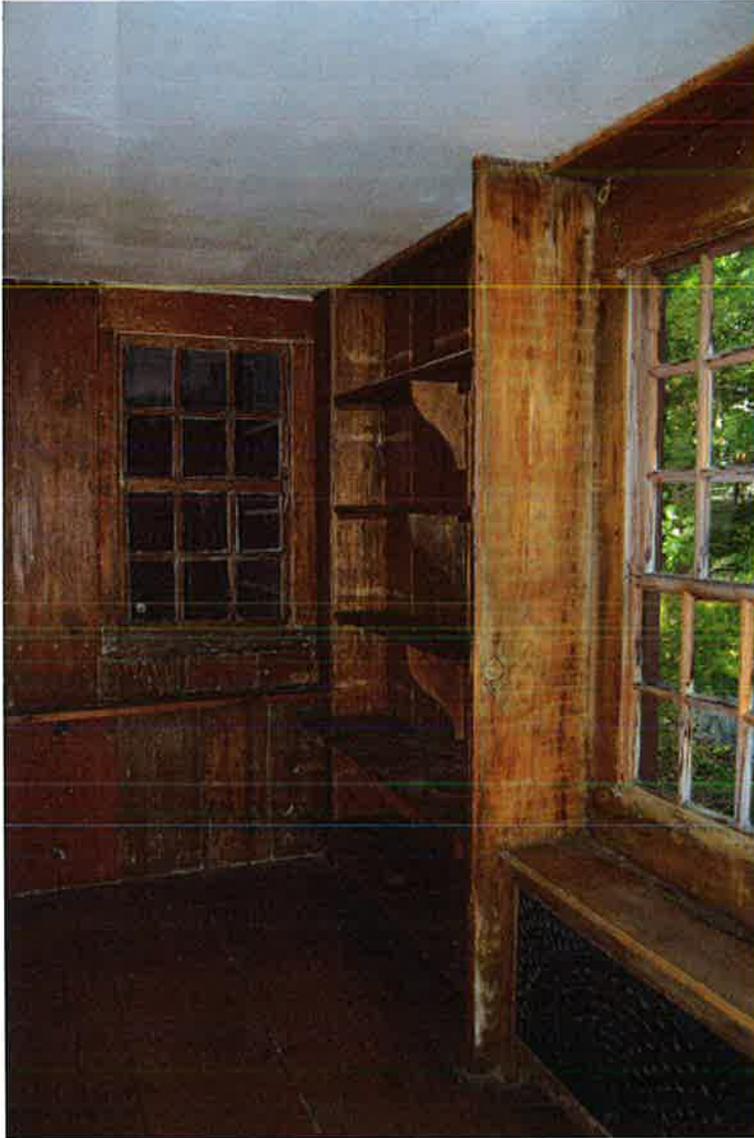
Buttery looking northeast. The window at the north wall was originally an exterior window and is now located within the rear ell.
